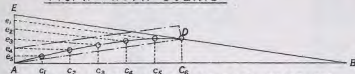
CONSTRUCTION OF ROAD TEMPLAT
